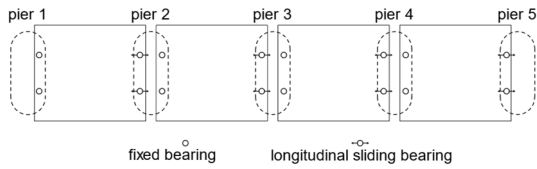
Bearing arrangement of the simply supported girder bridge for single-track railway
